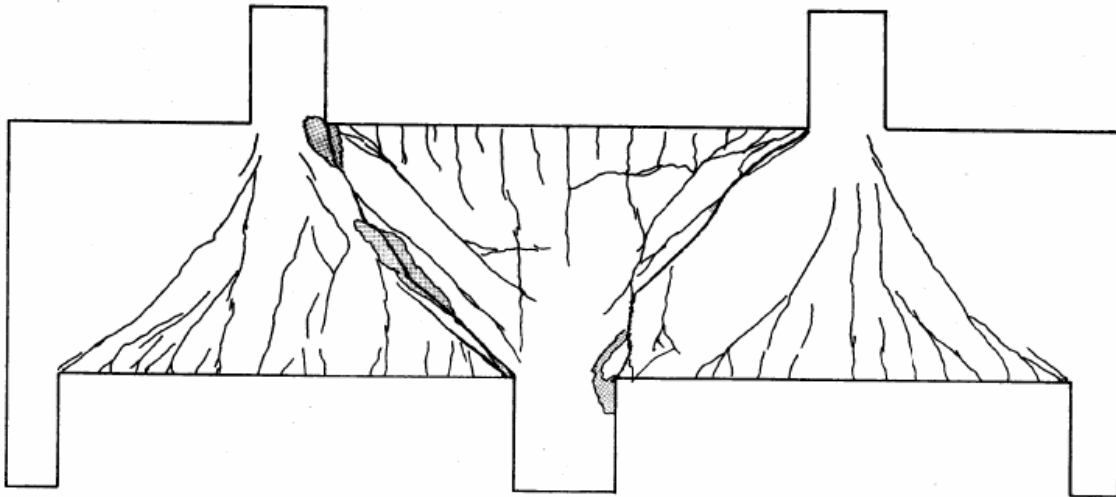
Crack pattern at failure of beam BM 6/1.0
